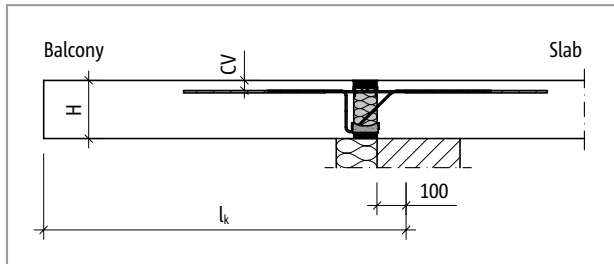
Schöck Isokorb® T type K-M1 to M11: Static system
